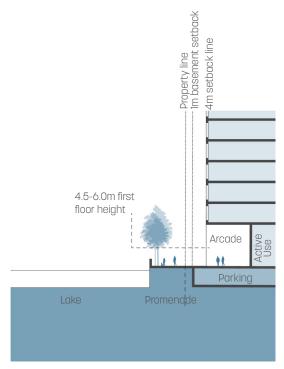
Section of Cultural Centre Building, located within Lakefront Park
